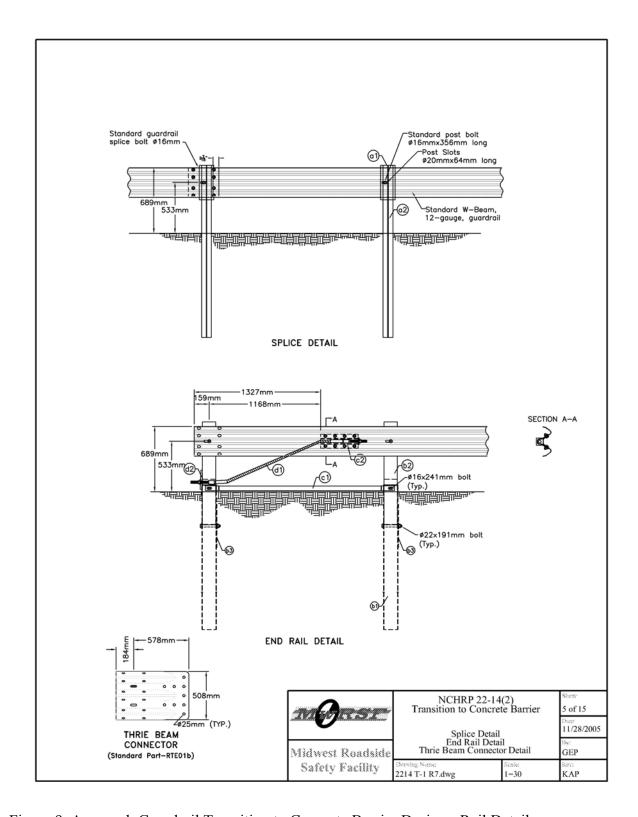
Approach Guardrail Transition to Concrete Barrier Design - Rail Details
